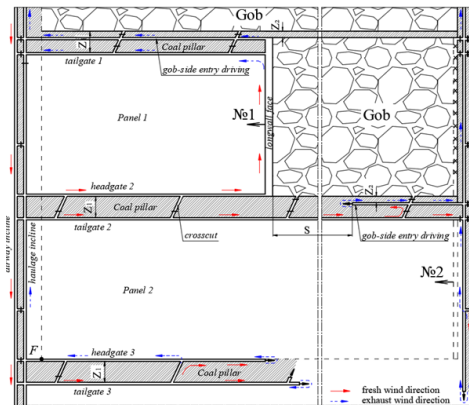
Longwall mining system, in which coal pillar will be extracted together with the adjacent longwall face
